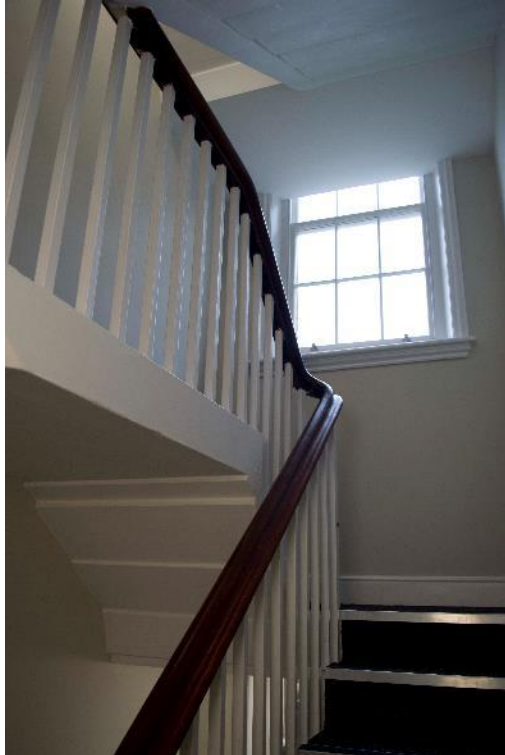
Station, Range 1, detail of truncated first floor stairwell window, facing south-east (170859_0004)
